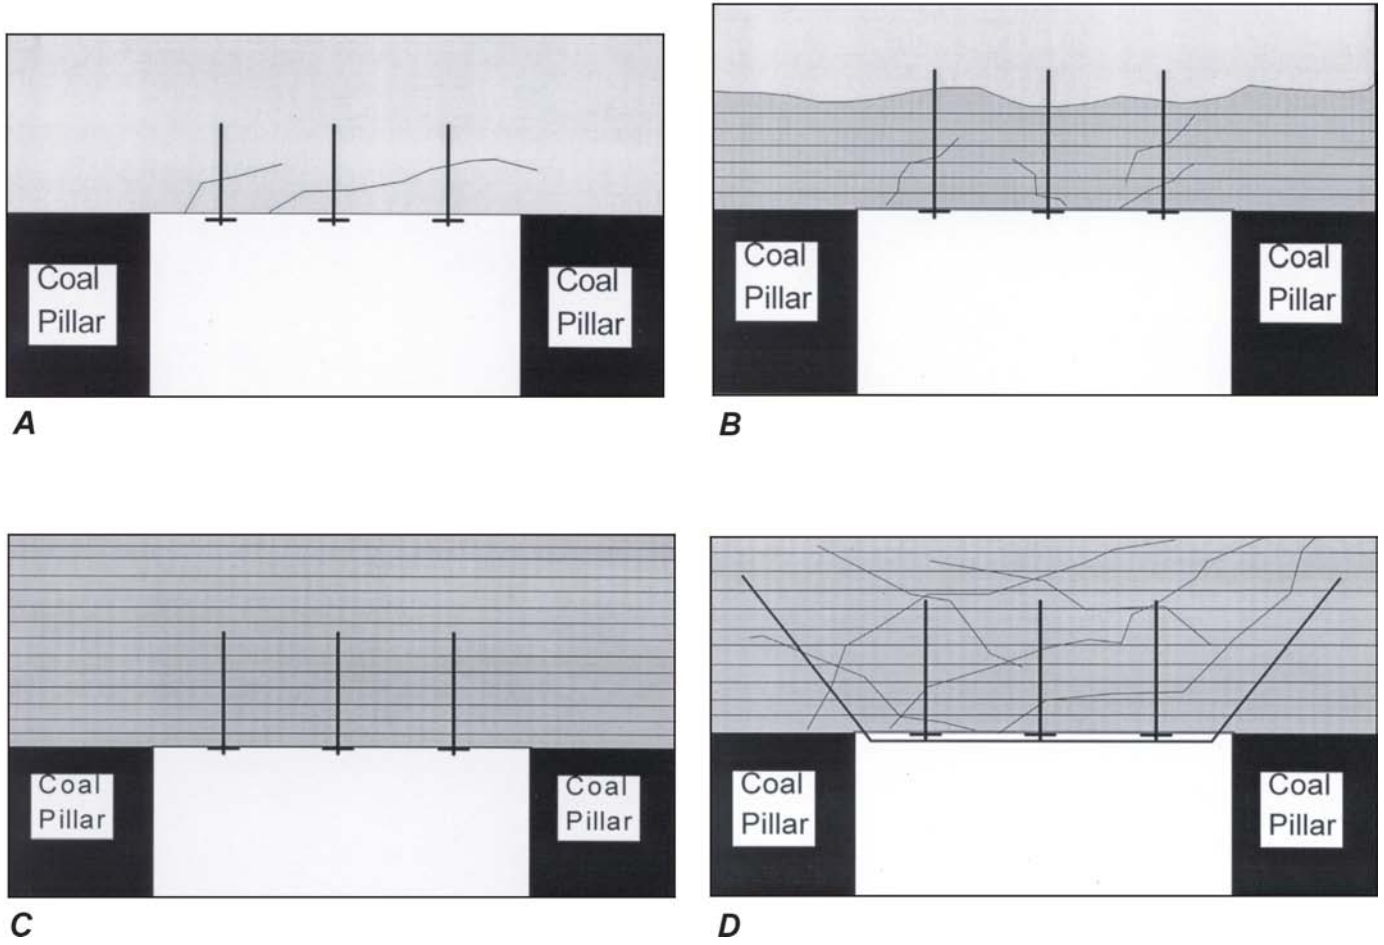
Roof support mechanisms. *A*, simple skin support; *B*, suspension; *C*, beam building; *D*, supplemental support in failing ground.
